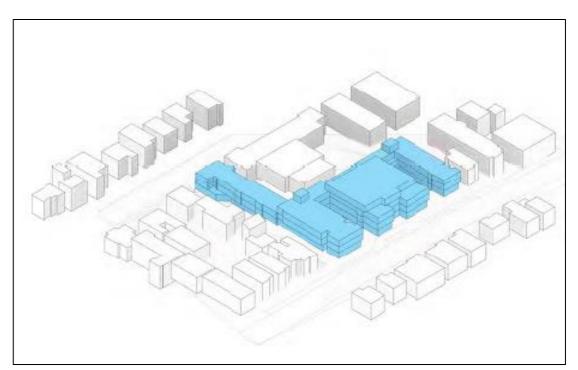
Proposed Massing looking South West Source: O'Neill Architecture
